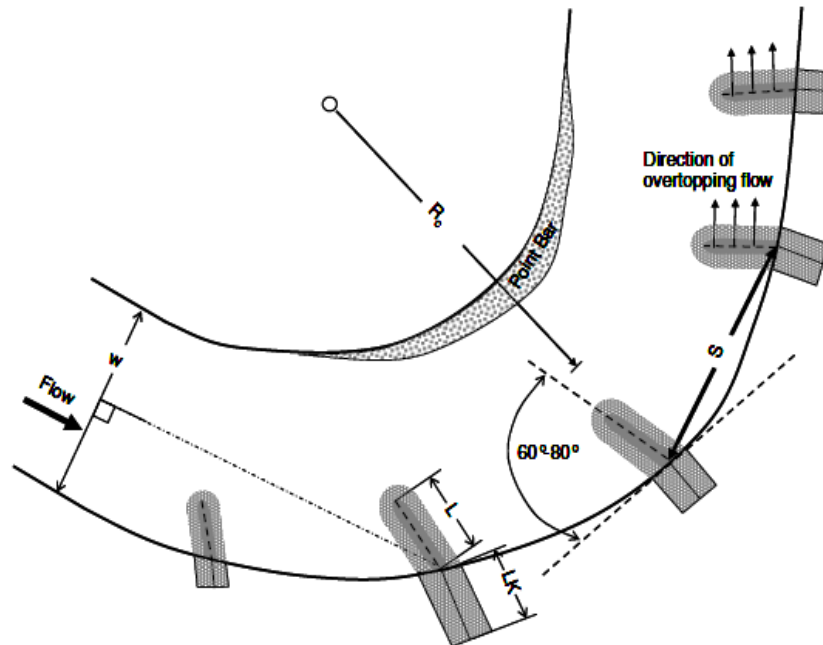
Bendway weir typical plan view. From HEC 23, Design Guideline 1 (FHWA, Sept 2009).
